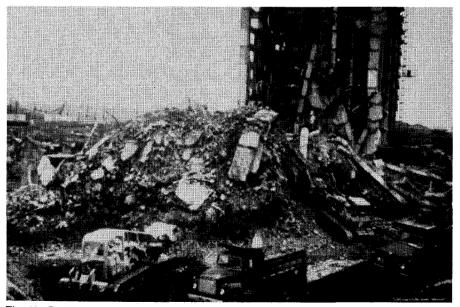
Debris at base of tower due to building collapse (Bailey's Crossroads, Virginia).
